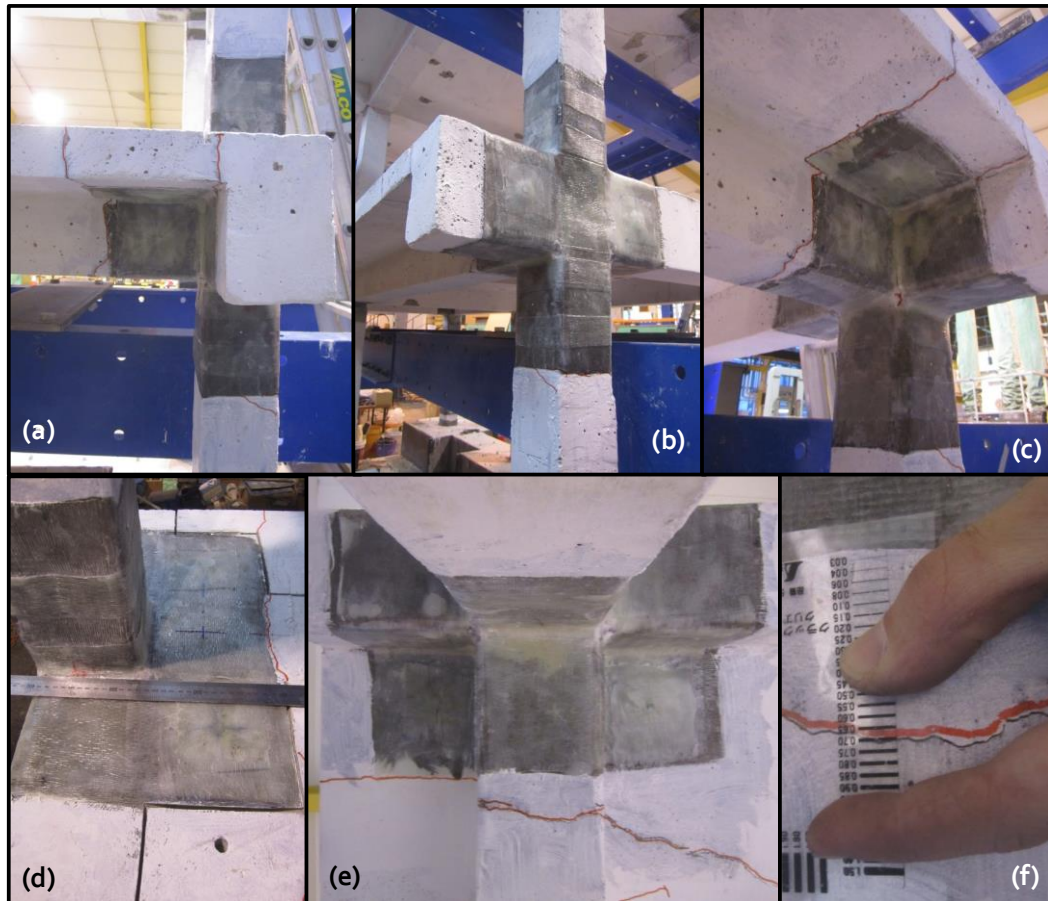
Observed damage in the 1st floor long span cruciform beam column joint; (a) front view, (b) 3D view from the front, (c) 3D view from the bottom, (d) top view over the beam-slab, (e) view from below, and (f) view from the bottom – beam crack close-up.
